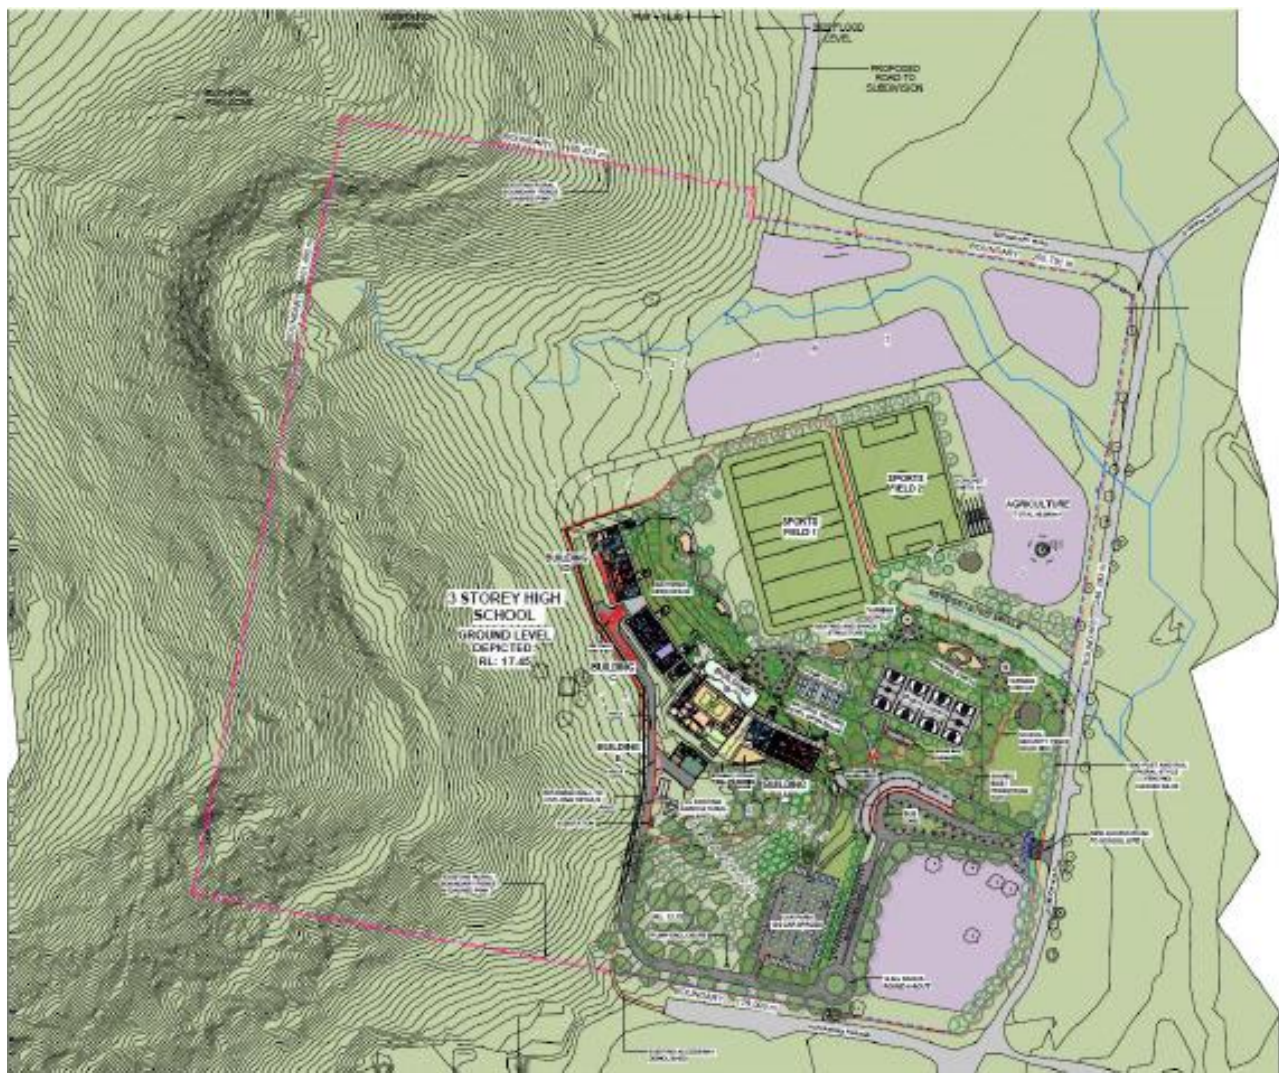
Overall site context plan. Source: EJE Architecture, 2025
